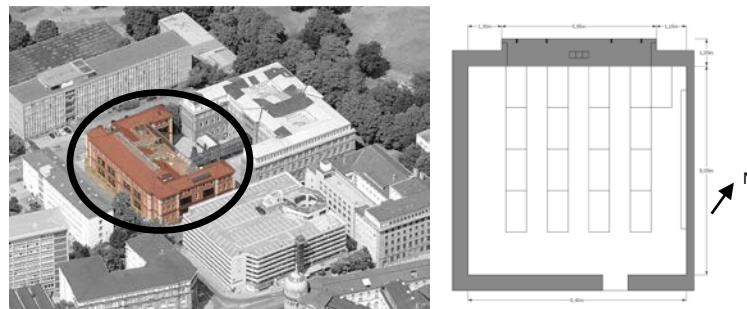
Bird's-eye view of the building and floor plan of the lecture room in Stuttgart
